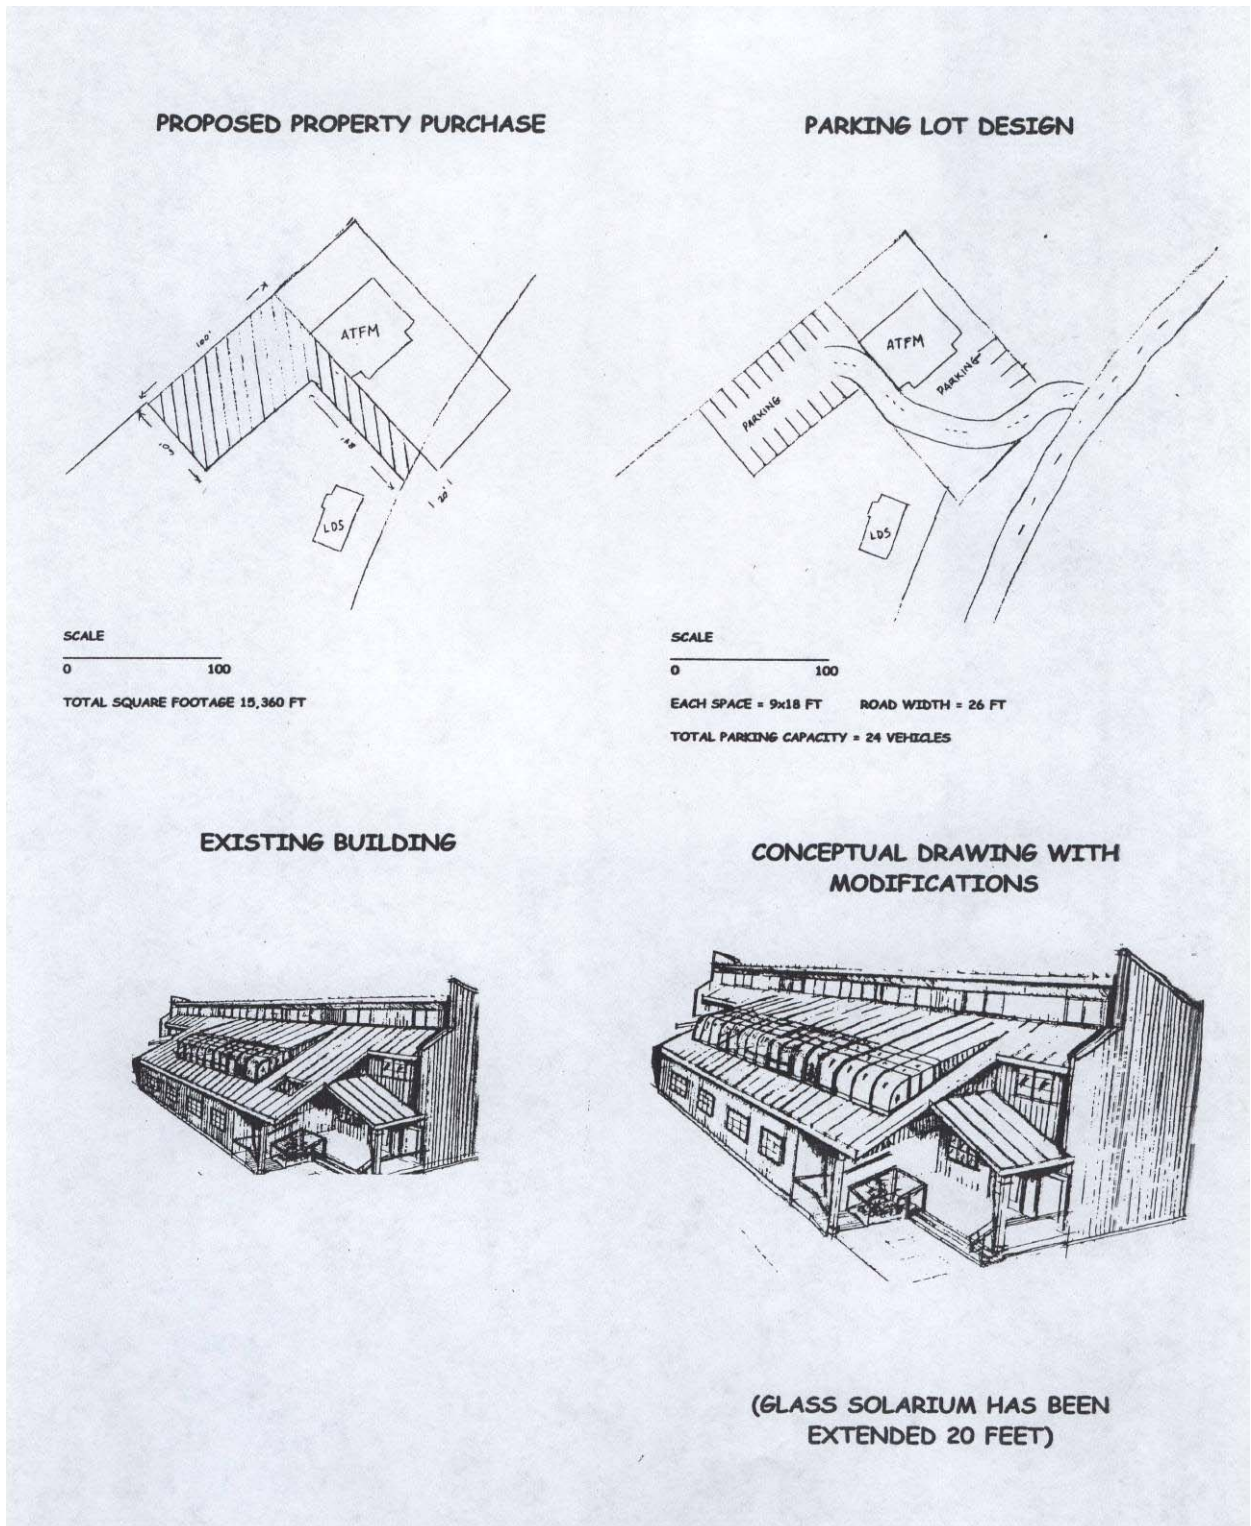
Proposed Property purchase, parking lot design, and conceptual drawing of building exterior
